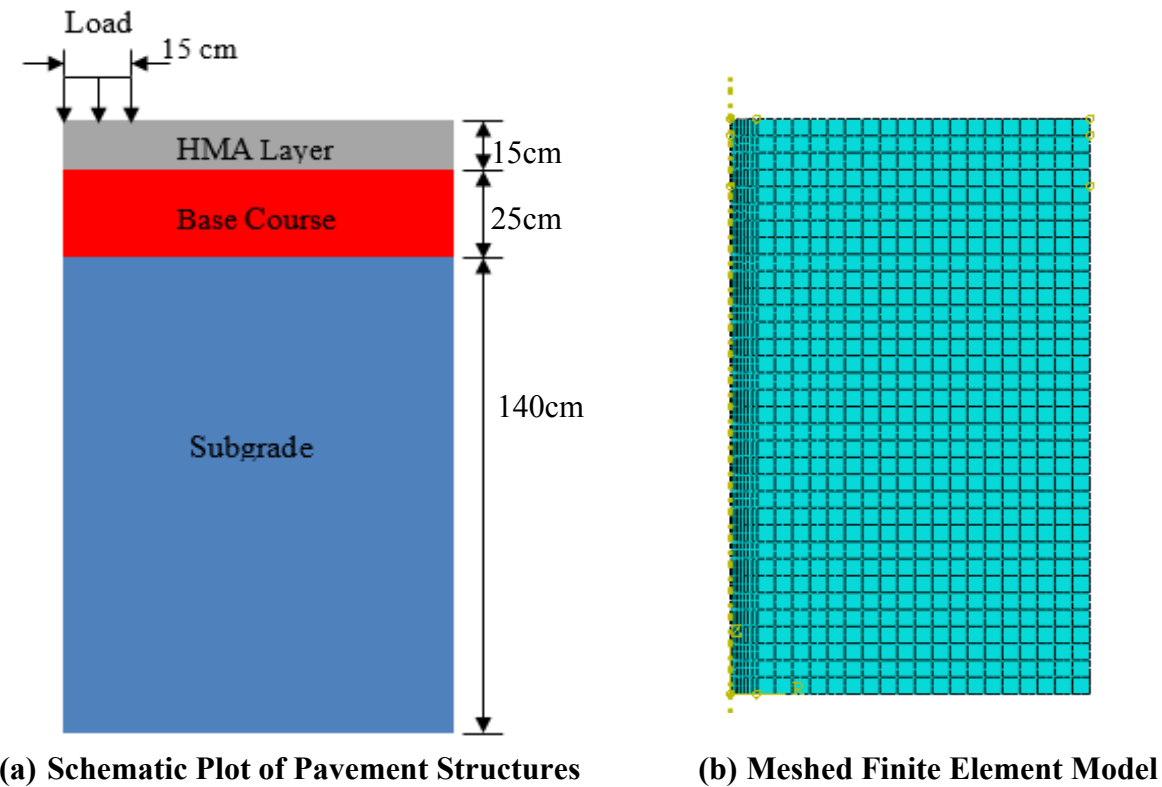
Finite Element Modeling of Flexible Pavement Structures
